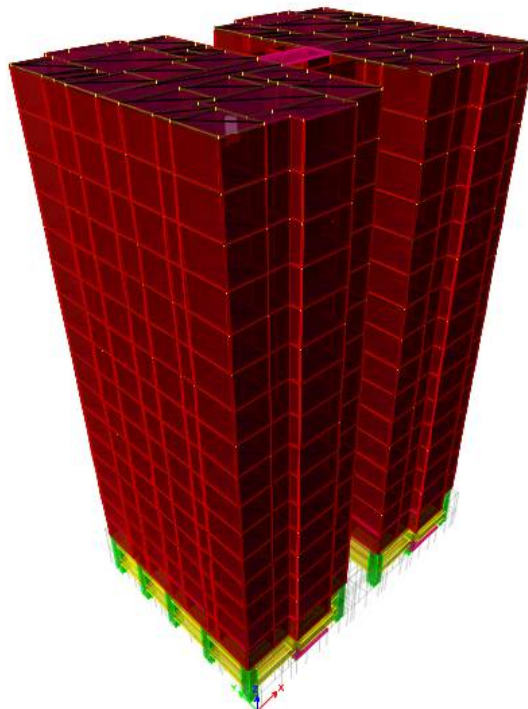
Shear wall structural model-2, with shear wall and flat slab system
